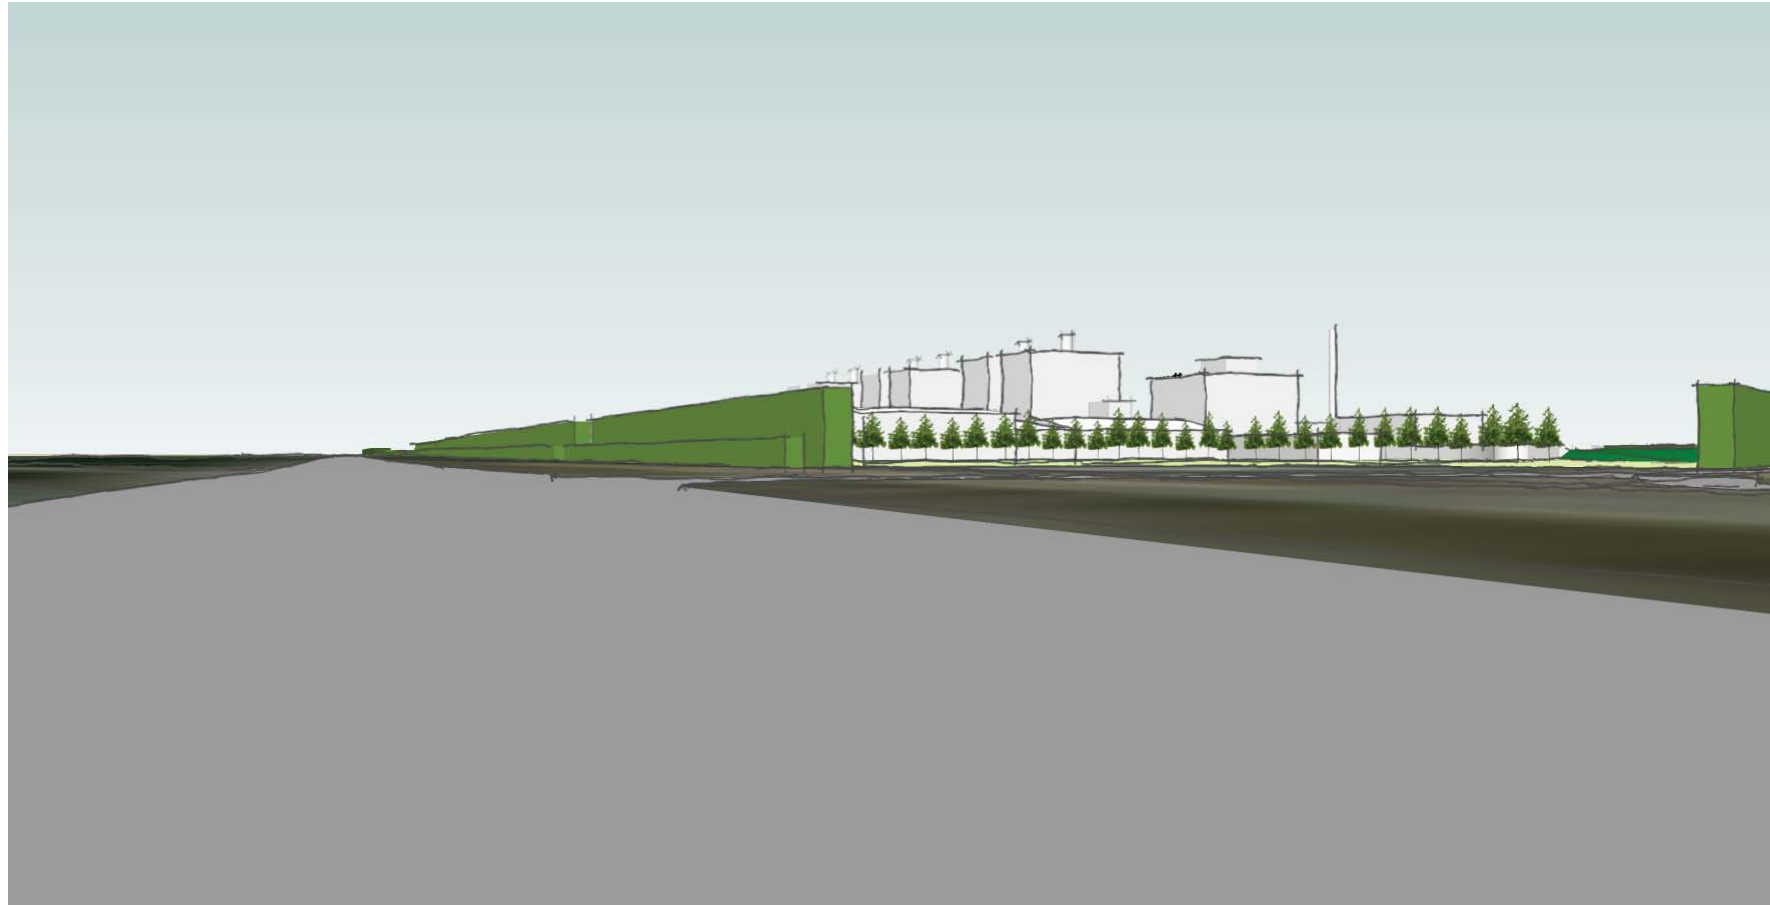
View towards the site from the SH1/ Parkins Road intersection showing established planting and potential Stage 1 and 2 building development. (Note: excludes substation from view)
